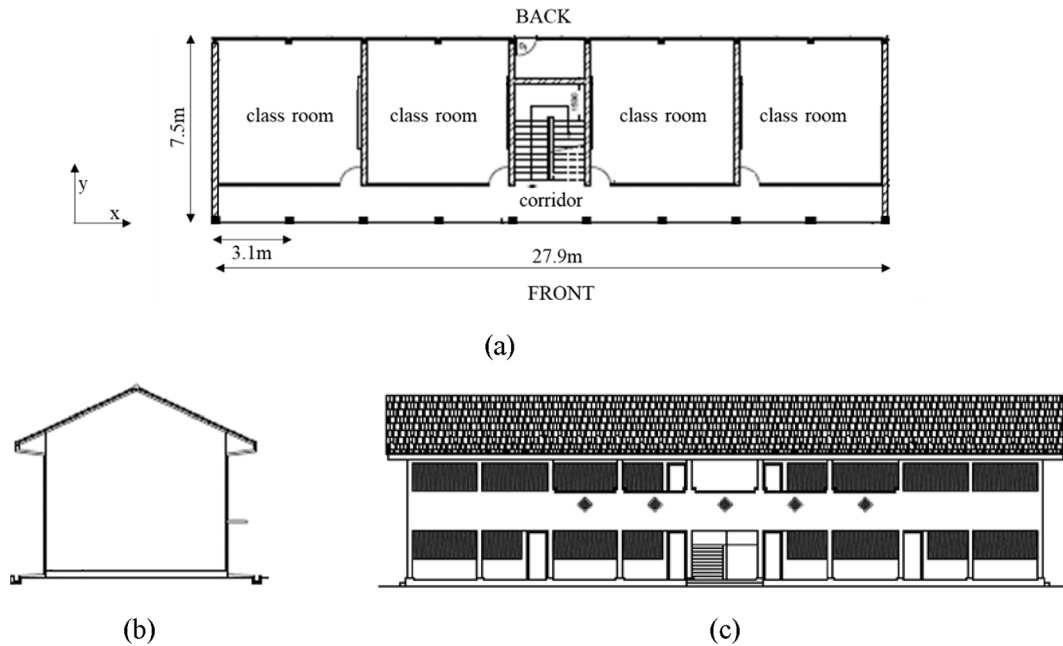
Typical two-storey school building configuration: (a) ground floor type plan, (b) elevation in longitudinal direction – view from front, (c) elevation in transverse direction.
